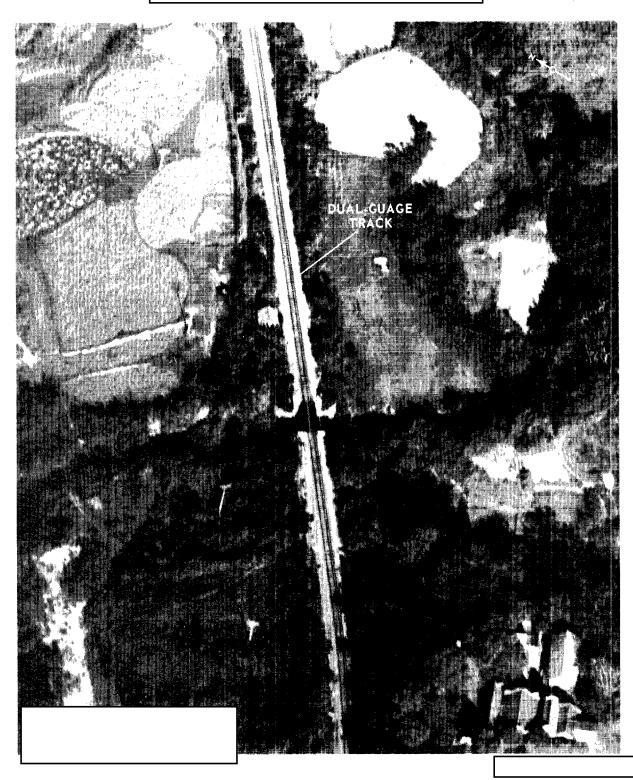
A. STANDARD GAUGE RAIL LINE UNDER CONSTRUCTION, NORTH VIETNAM
